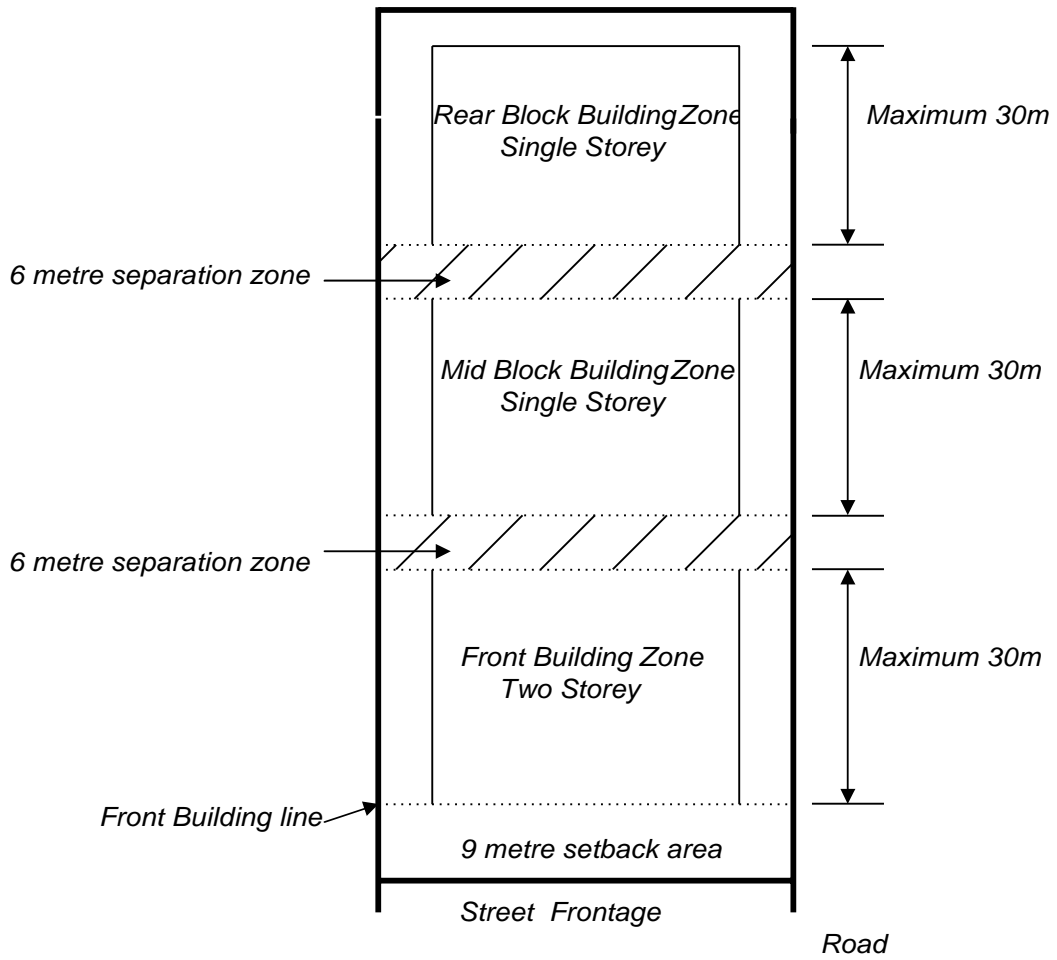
A: BUILDING DESIGN FOR TOWNHOUSE/VILLA DEVELOPMENTS
